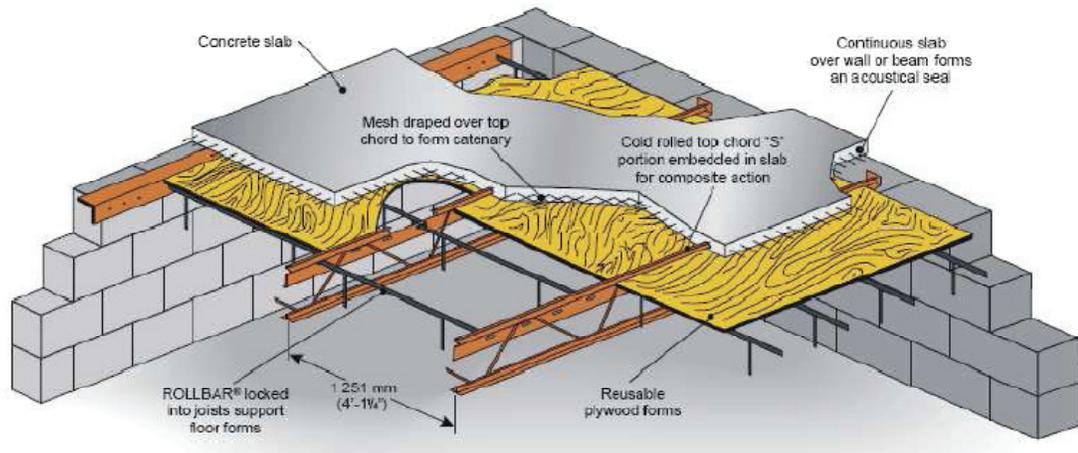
Hambro D500 Floor System (*Canam,2004*)
